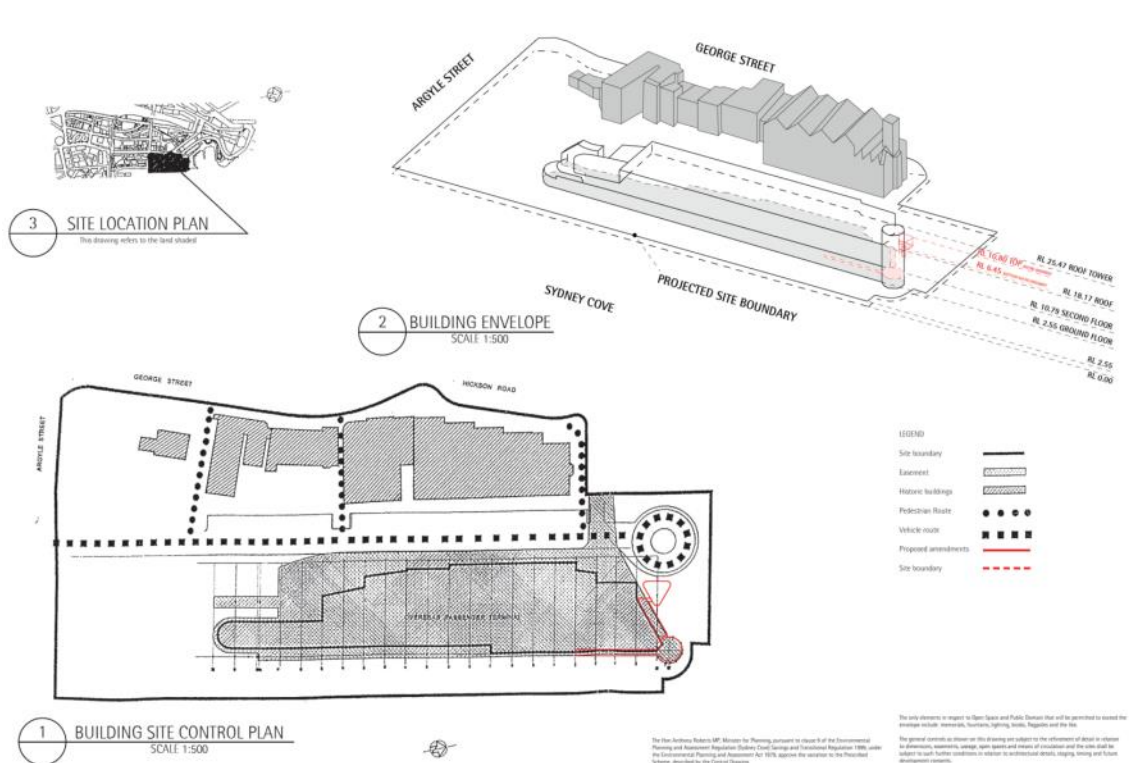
The current SCRA Scheme Building Site Control Drawing (Source: SSD 7683)
